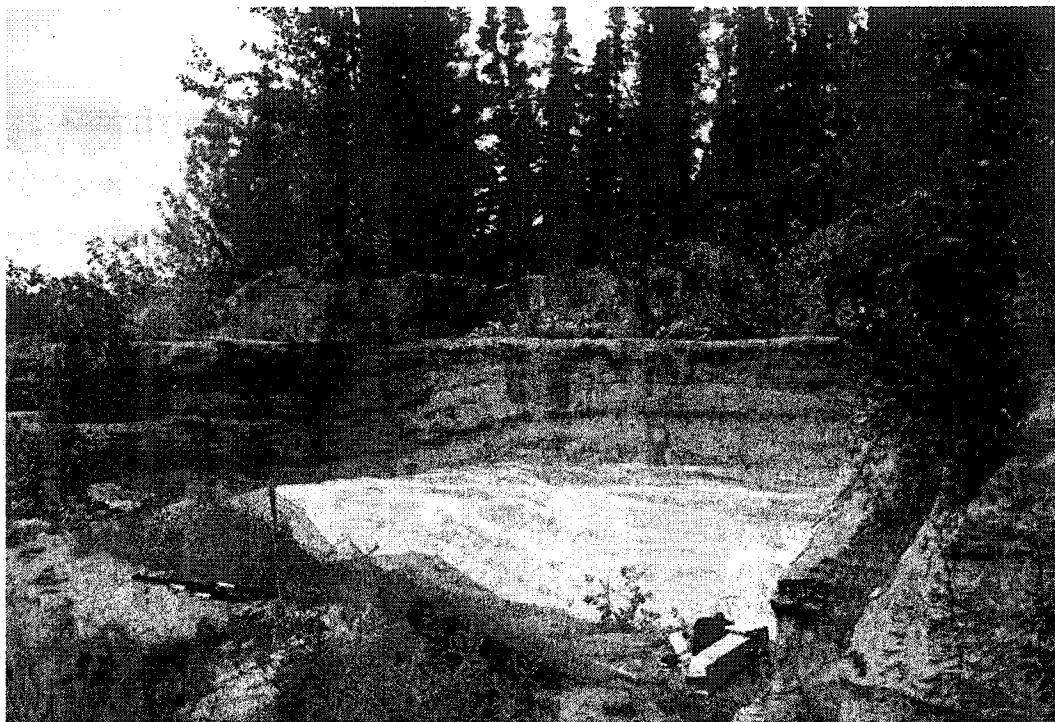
Site prior to backfilling, base of excavated area, view northwest.
